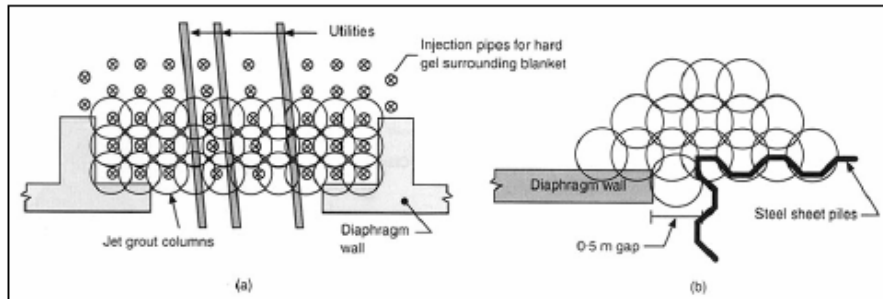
Miscellaneous jet grouting at Cairo Metro.
